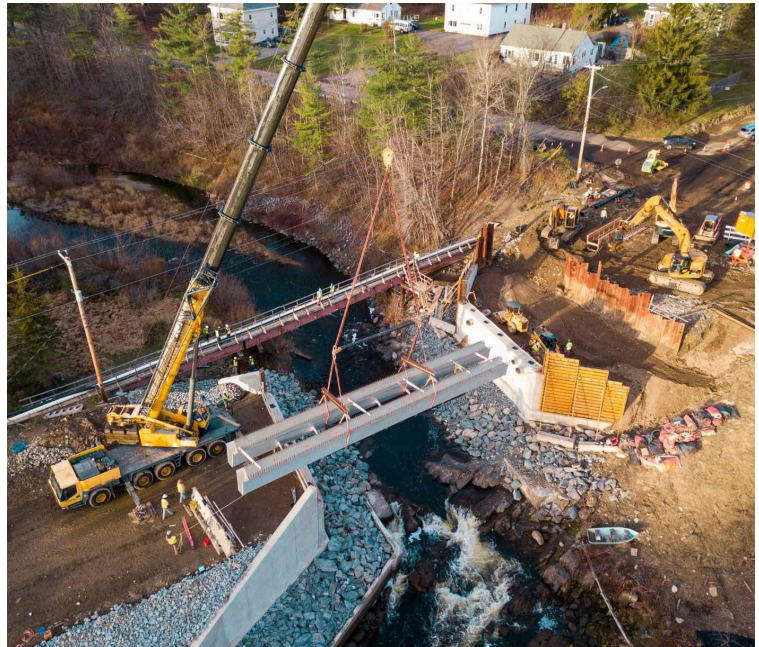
FRP girders being lowered into place at test site. Source: TIDC (project final report)
